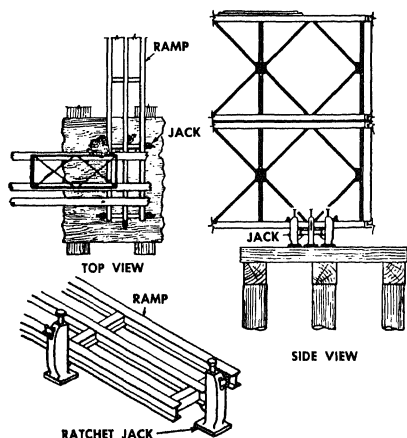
Jacking over intermediate pier—six ratchet jacks arranged under ramp section under lower chord of trusses.
